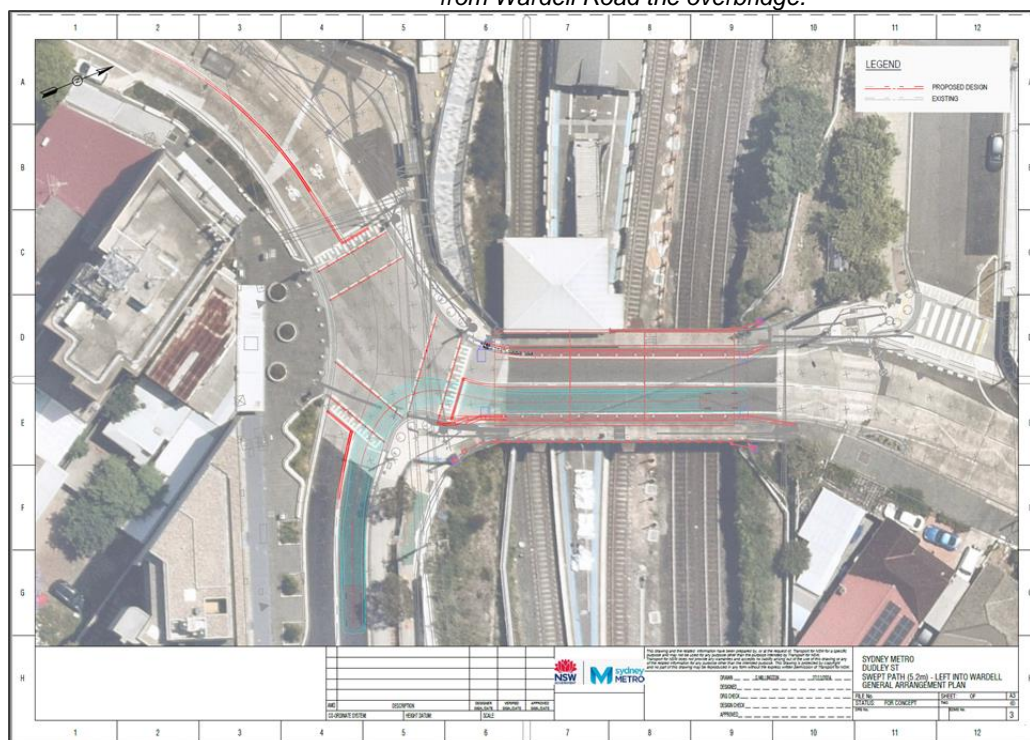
Turn paths with proposed road safety barriers for 5.2m long vehicles turning left into Dudley Street from Wardell Road the overbridge.
